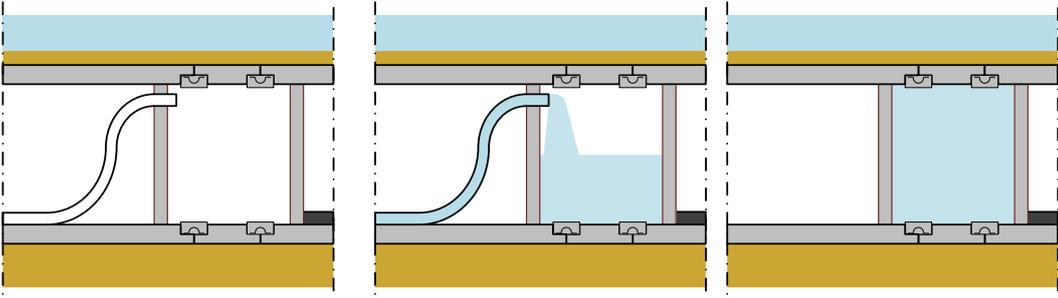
, BULKHEAD WATERTIGHT TESTING PHASING; LONGITUDINAL VIEW
